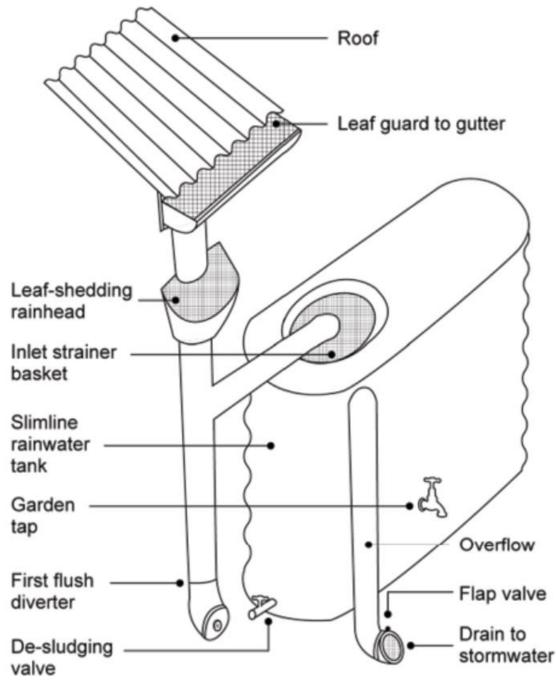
Typical Rainwater Tank Arrangement (without detention space)
